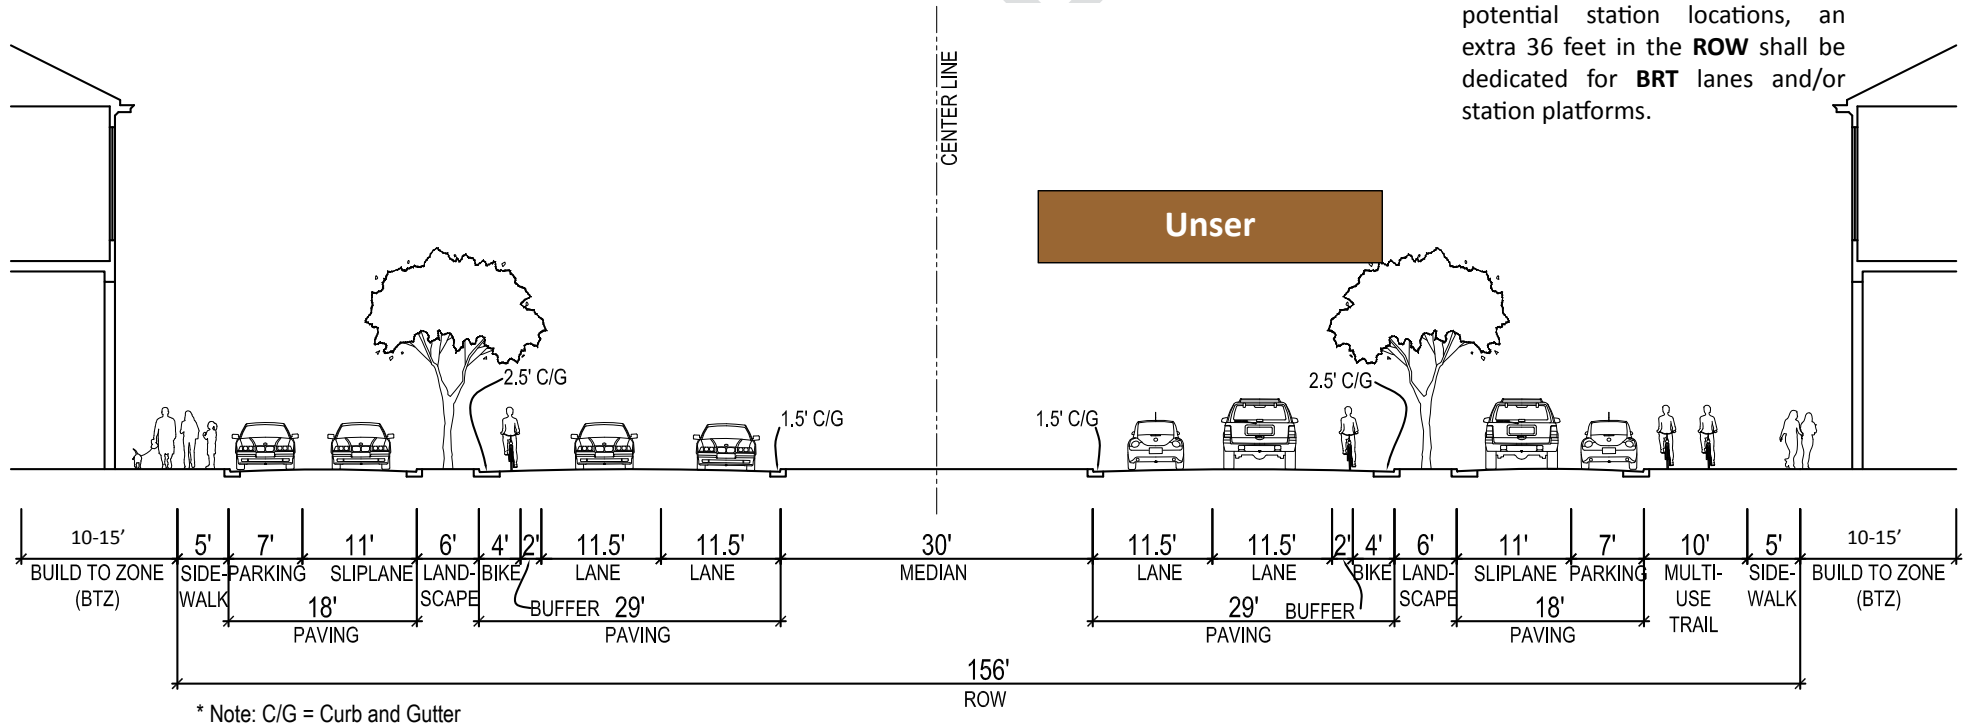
Street Type 6: Unser Boulevard Cross Section
